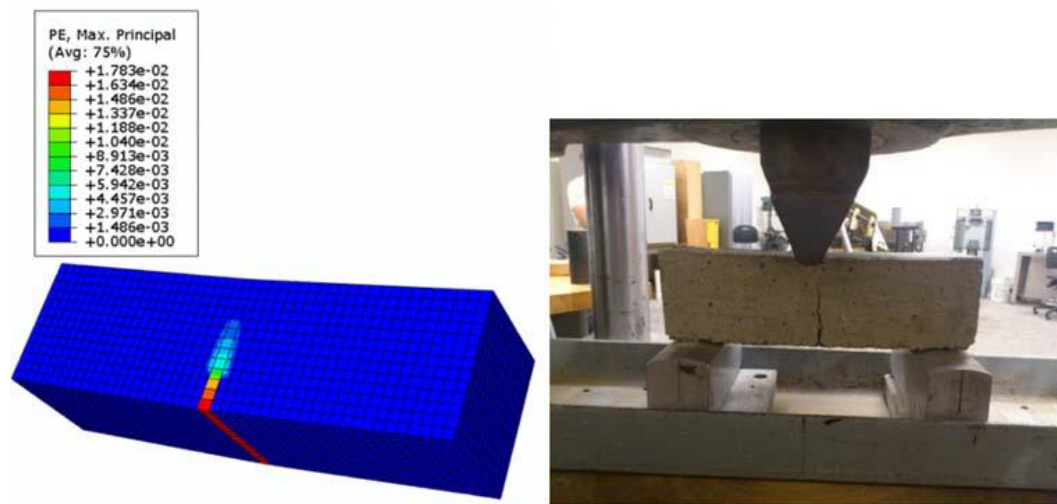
Crack propagation in the bare concrete beam
